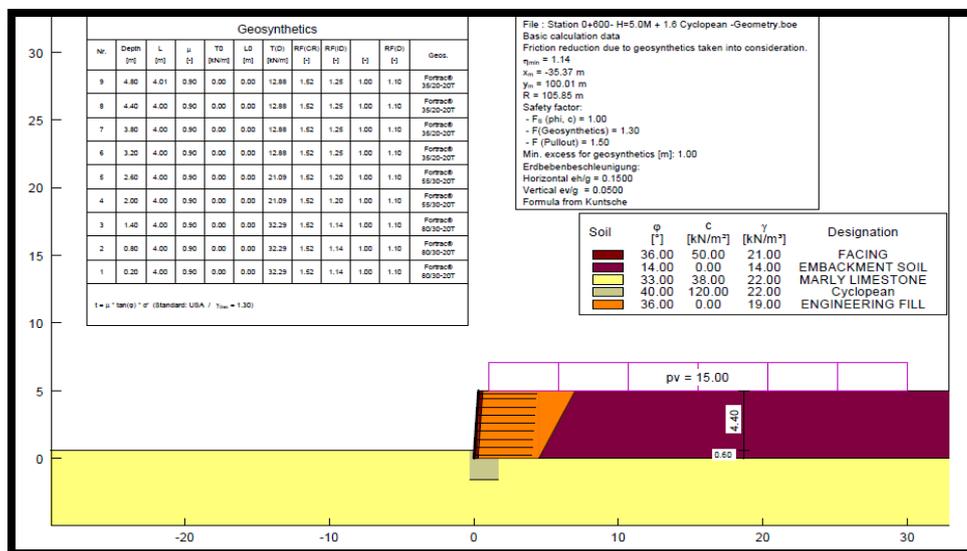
Design details for the case study (reinforced soil wall) at station (00+660) using GGU software (step 1)
